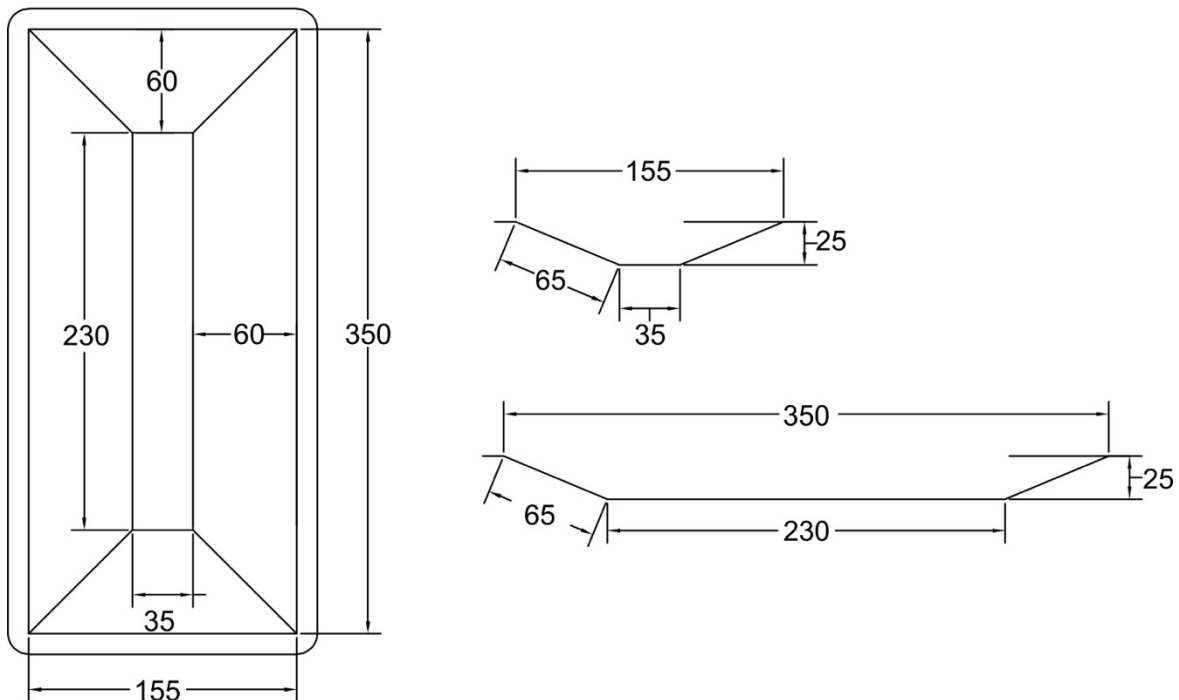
Dimensions of the lined lakes in plan and cross-section.
